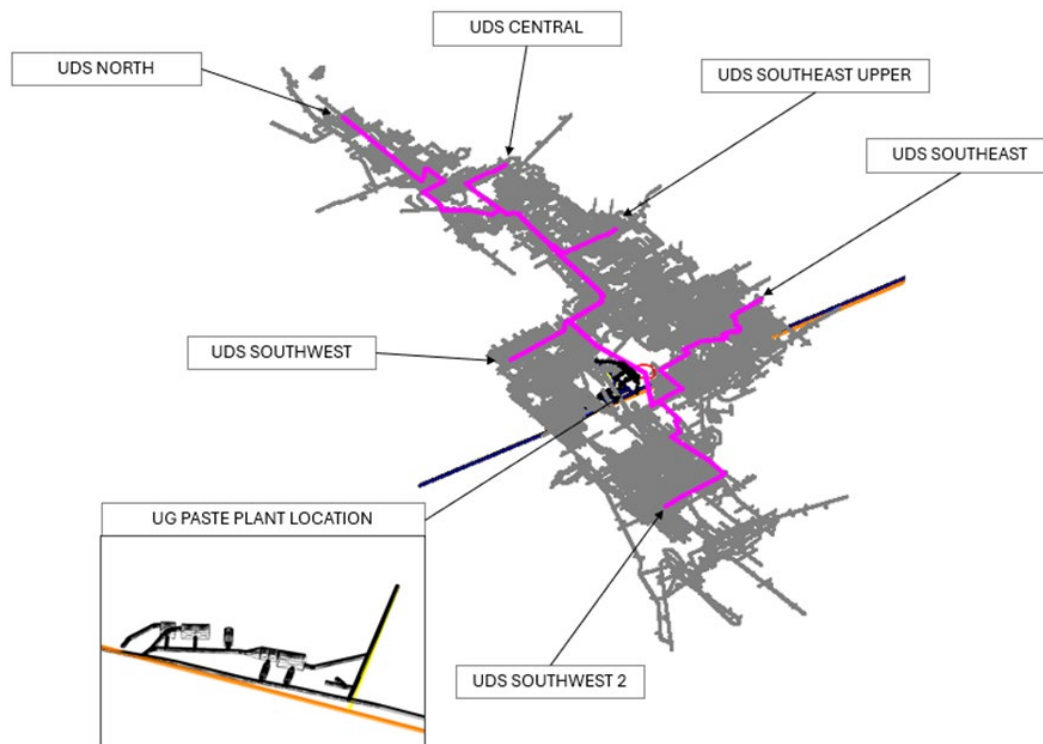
Underground (UG) paste backfill plant location and underground distribution system (UDS) (Senis & Hall 2025)
